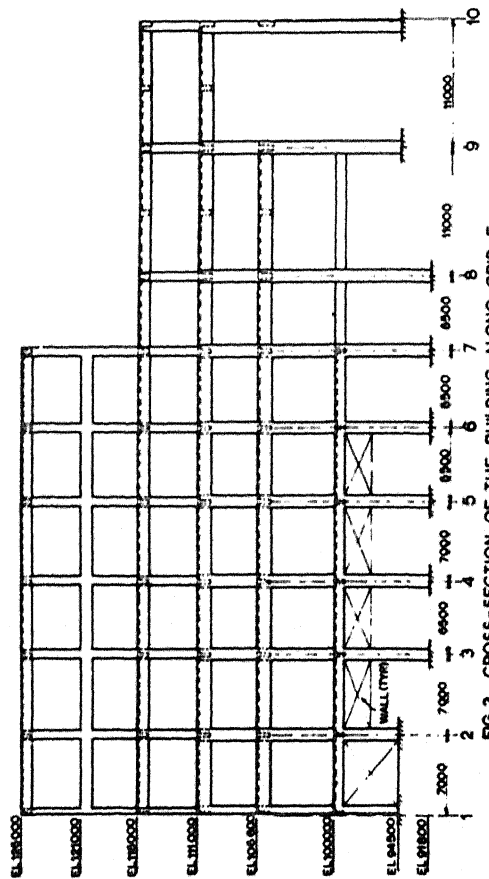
CROSS-SECTION OF THE BUILDING ALONG GRID F
